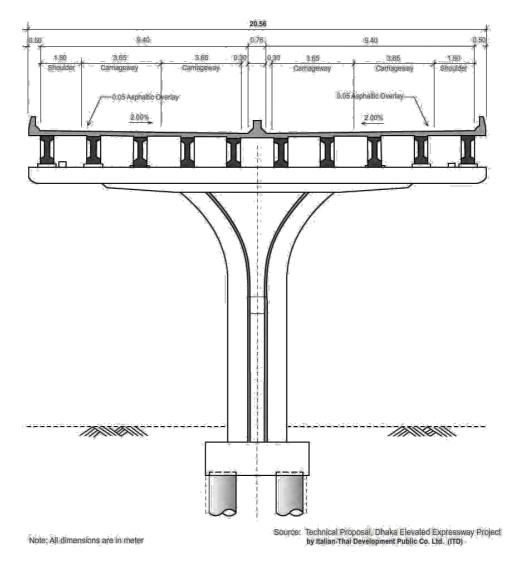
Overall structural section of main line with I-girder on single column pier (Source: Technical Proposal of Italian-Thai Development Private Company Limited, 2010)
